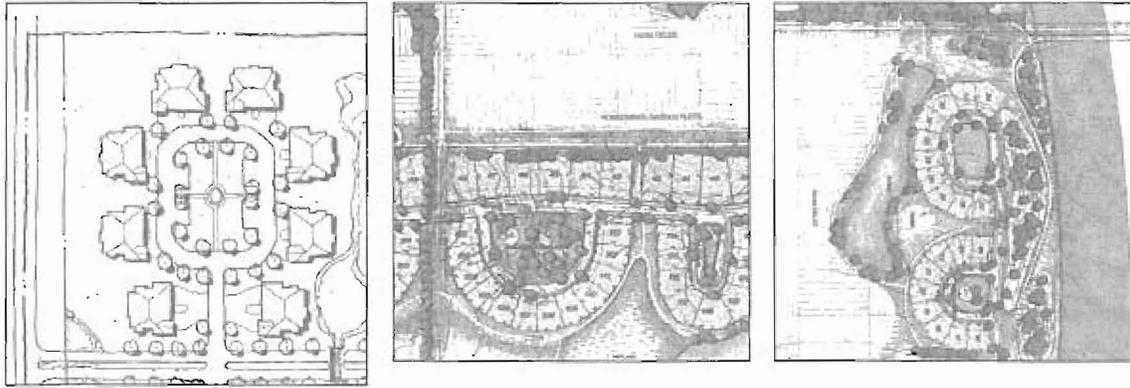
Examples of alternatives to typical cul-de-sac street design
